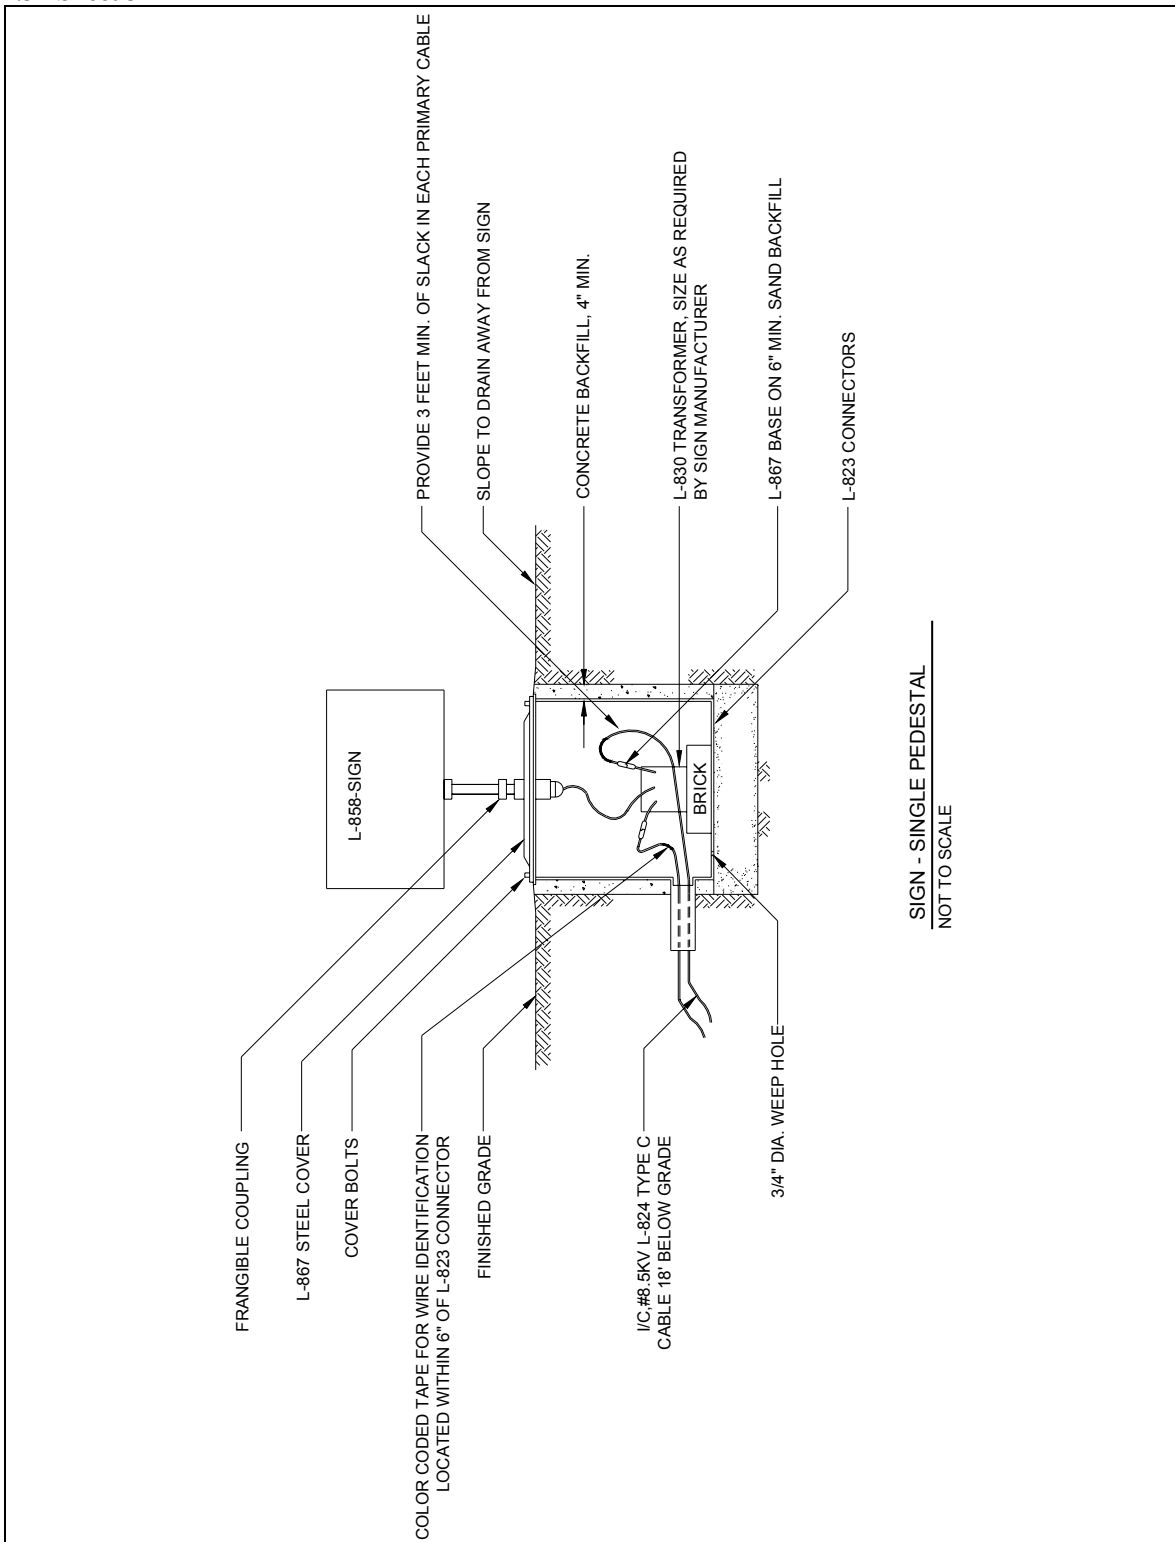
Standard Details for Taxiway Hold and Guidance Sign – GL-600 Sheet 3A – Sign – Single Pedestal
